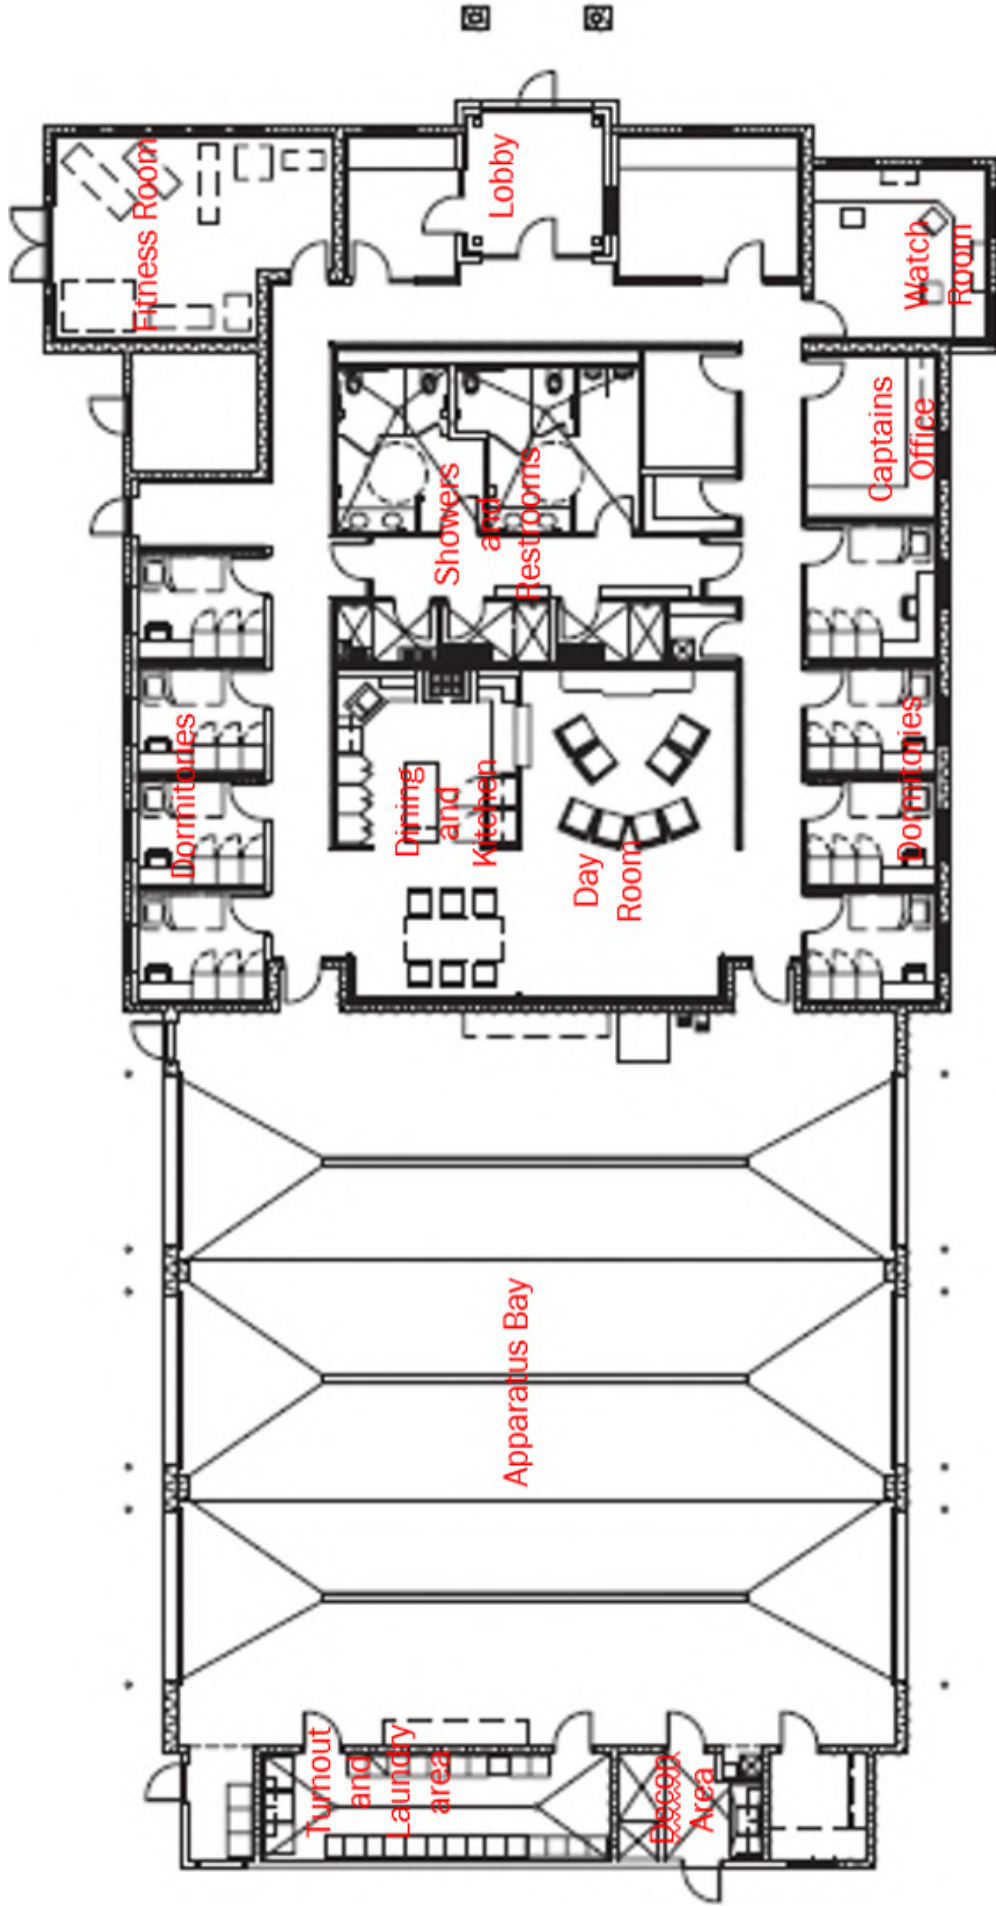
Commercial Three-Bay Fire Station Floor Plan Configuration
